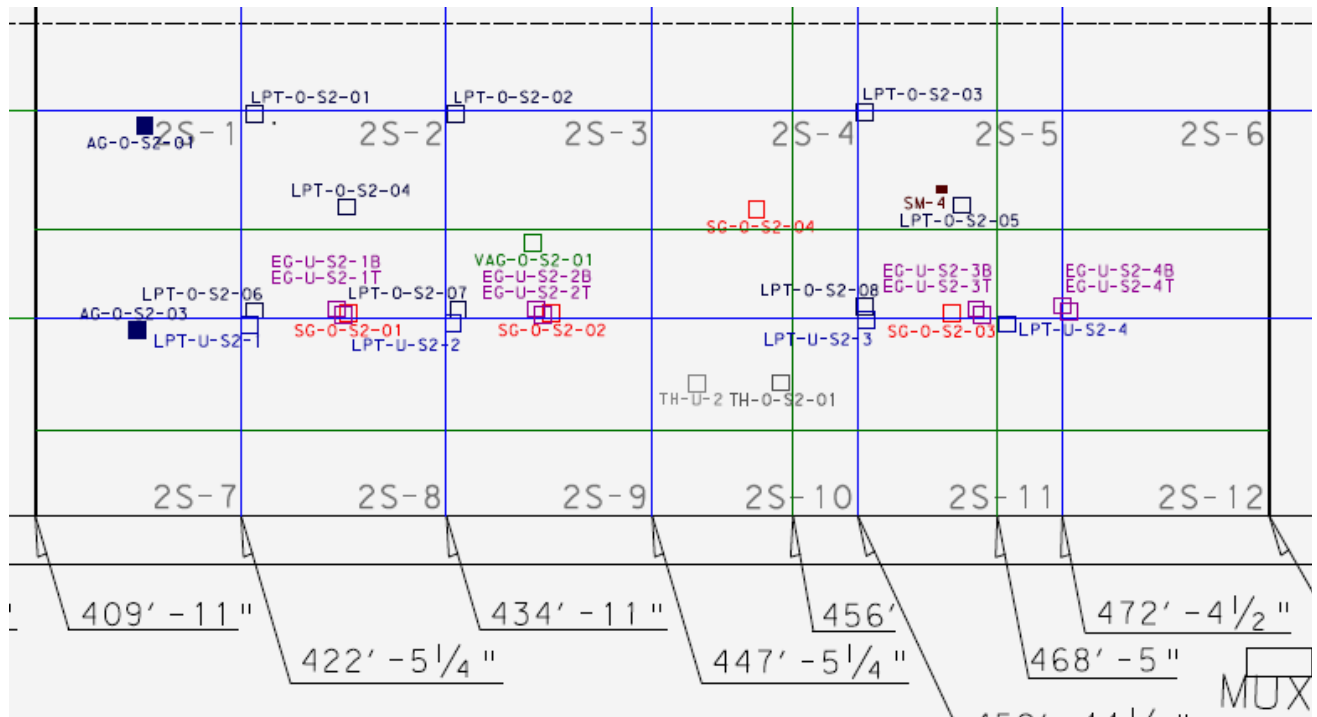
SCI EXPERIMENT OVERLAY AND UNDERLAY JOINT LAYOUT, SLAB DESIGNATIONS AND INSTRUMENTATION PLAN FOR TEST ITEM S2
